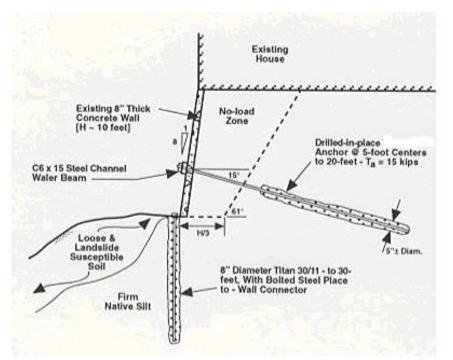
Schematic of underpinning and anchorage of existing concrete wall.
